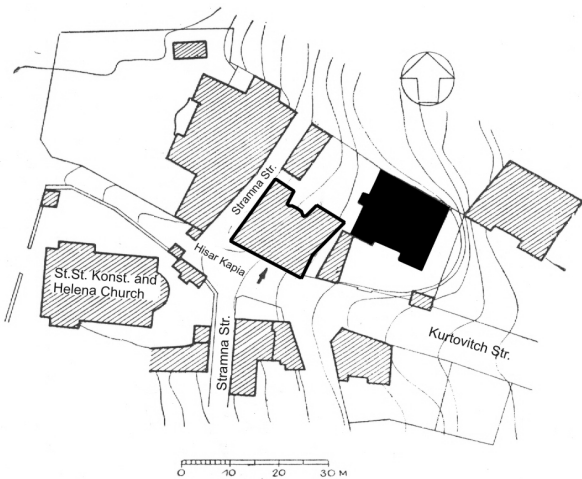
Site plan of Nedkovich House, marked in black [2, 218].
